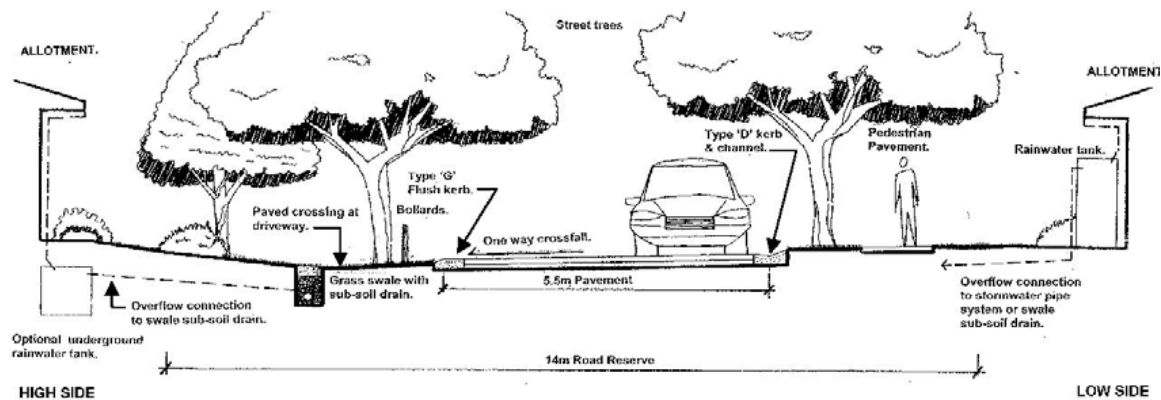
Typical Cross-Section of Grassed Swale (Source: GCCC, 2007)
